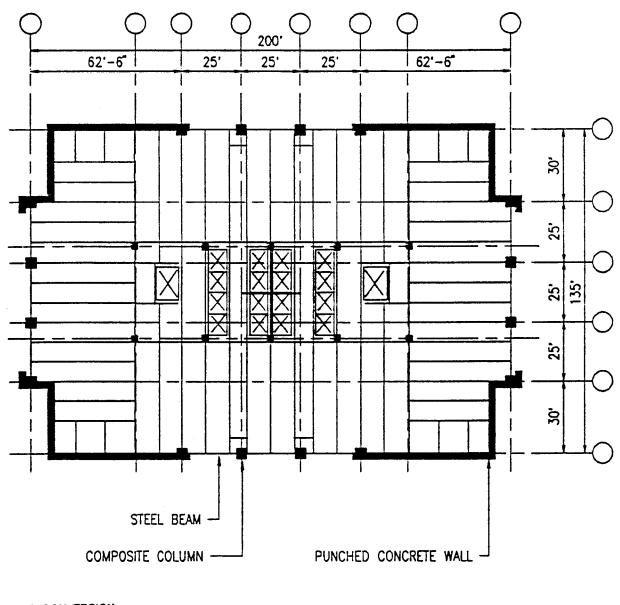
Composite shear wall and perimeter frame, First City Tower.
